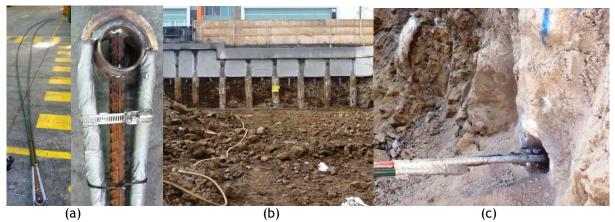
Test case removable anchors (a): Fabrication; (b) location; (c) installation
